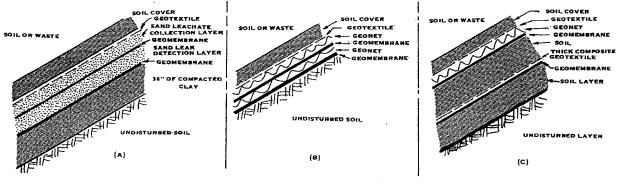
TYPICAL CROSS-SECTIONS OF COMPOSITE DOUBLE LINER SYSTEMS FOR HAZARDOUS WASTE LANDFILLS. 8 A/1
